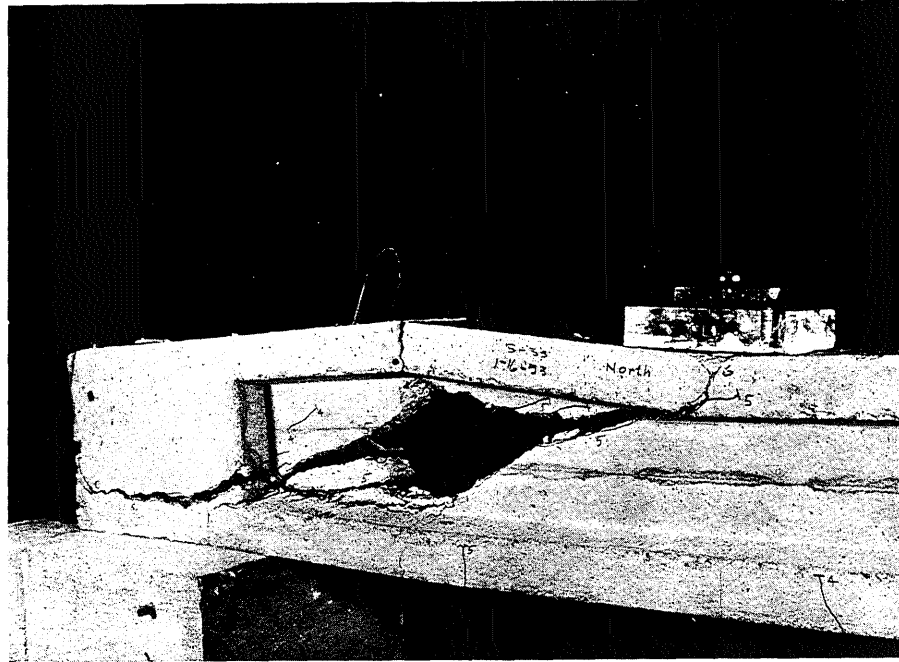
FAILURE OF I-BEAM WITHOUT EXTERNAL STIRRUPS ON END-BLOCK
